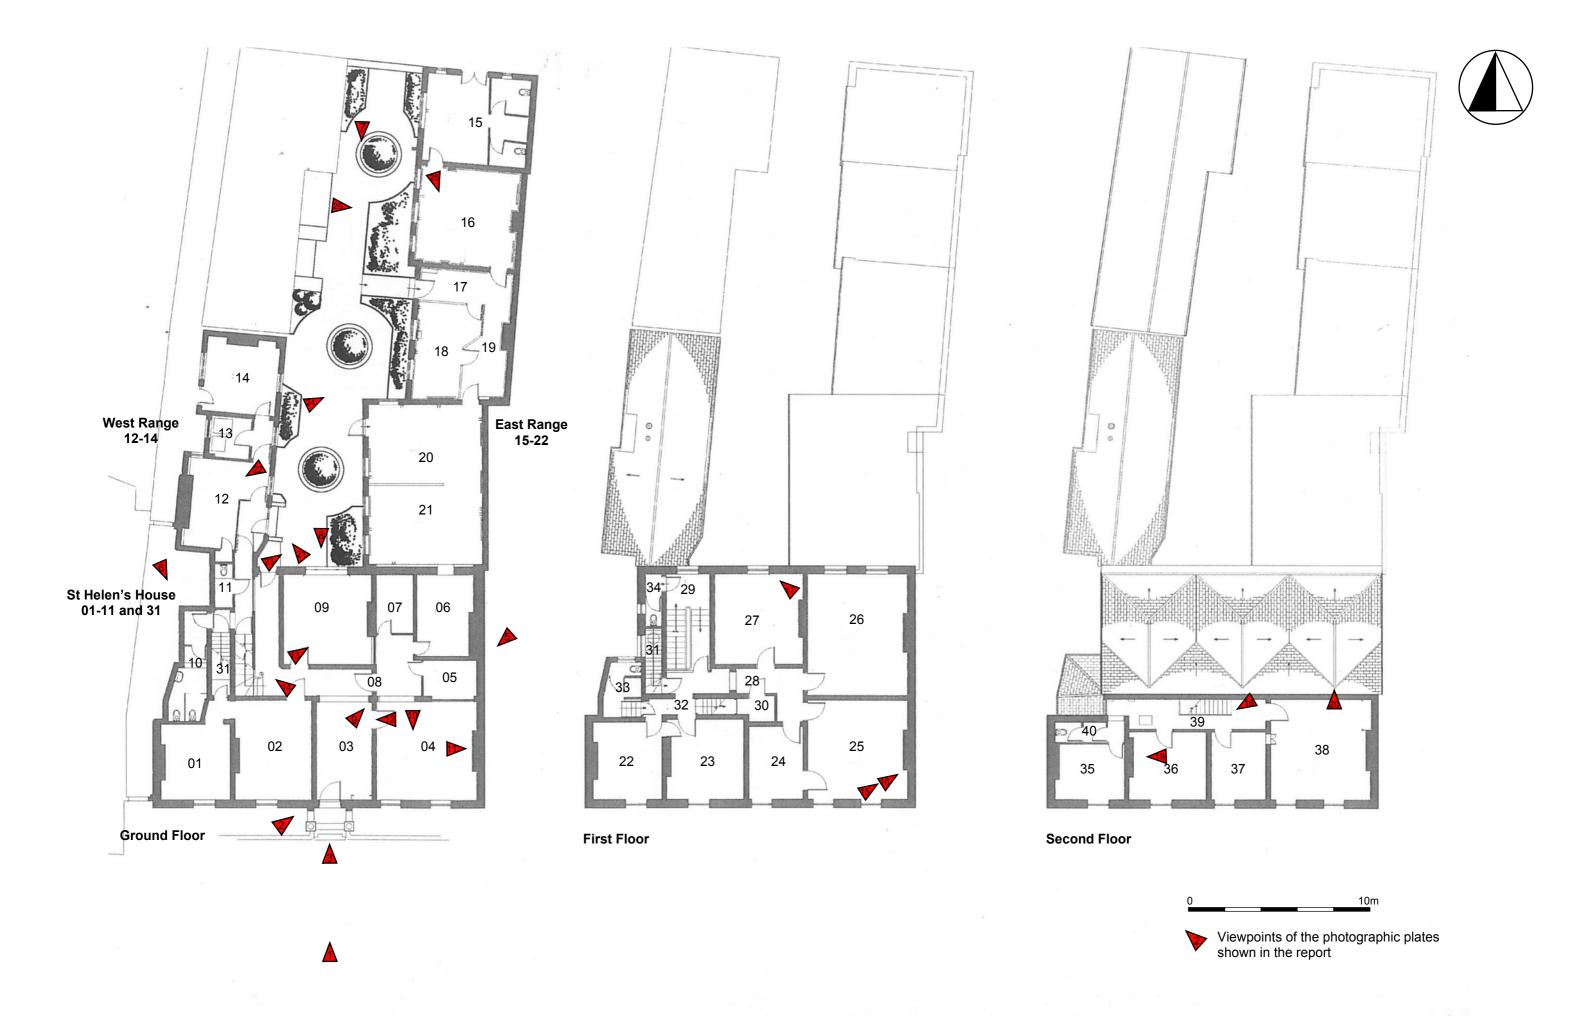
Plans of the ground, first and second floors of St. Helen's House, and the ground floors of the West Range and the East Range based on drawings provided by the client. Scale 1:200 at A3.
